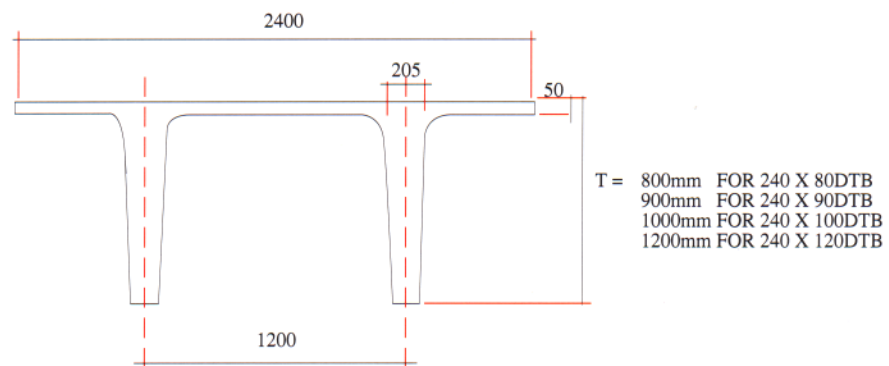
TYPICAL SECTION OF VARIOUS PRECAST SLAB ELEMENTS
